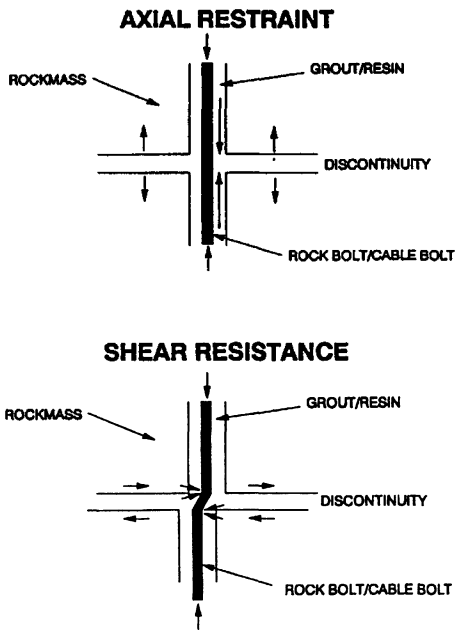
Axial and shear reinforcement from fully bonded bolts.
